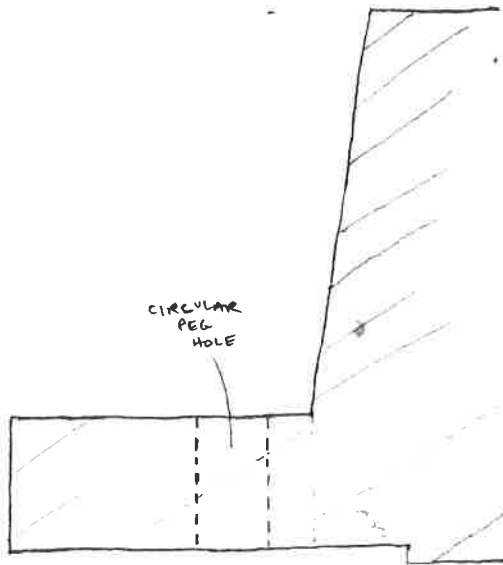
GROUND FLOOR PRINCIPAL JOIST
